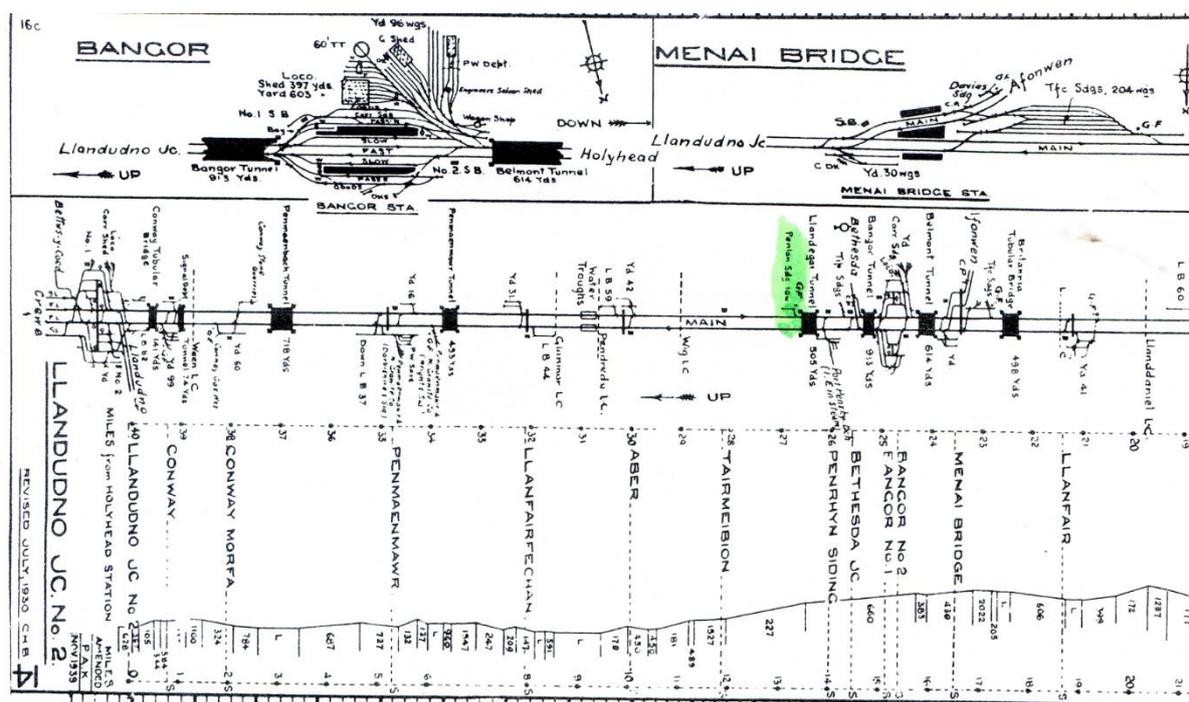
Railway plan from 1930 showing the siding adjacent to the east end of Llandegai Tunnel. It is marked as having a capacity of 10 wagons.³⁰⁹
